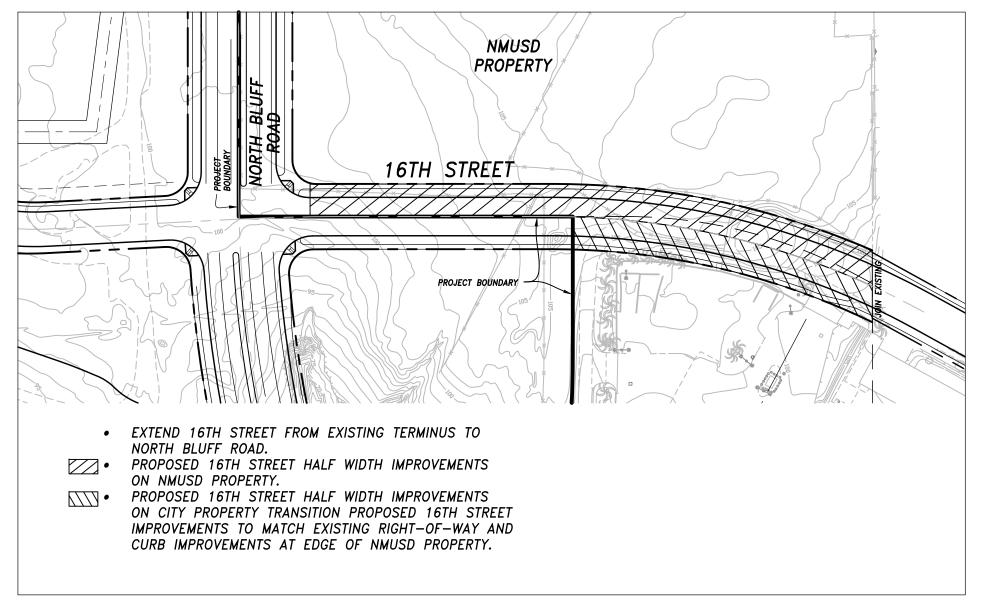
16th Street Entry and Off-Site Improvements
